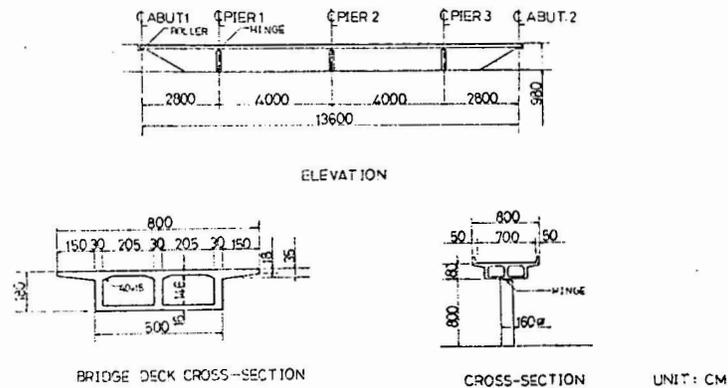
Elevation & Cross-Sections of Example 4-Span Bridge
